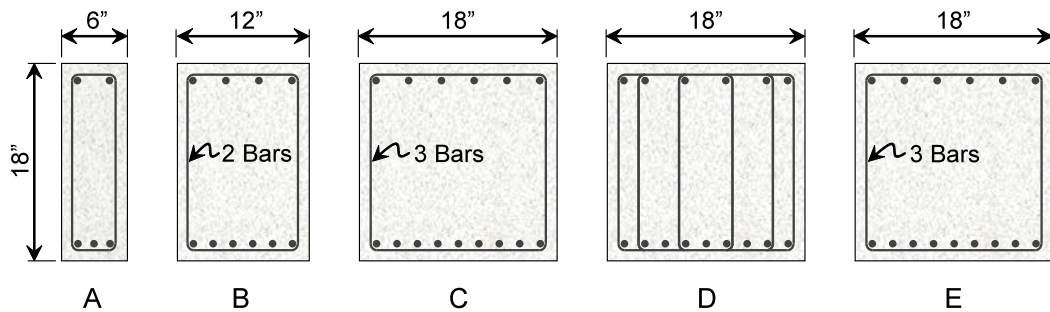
Details of specimens tested by Hsuing and Frantz (1985).
